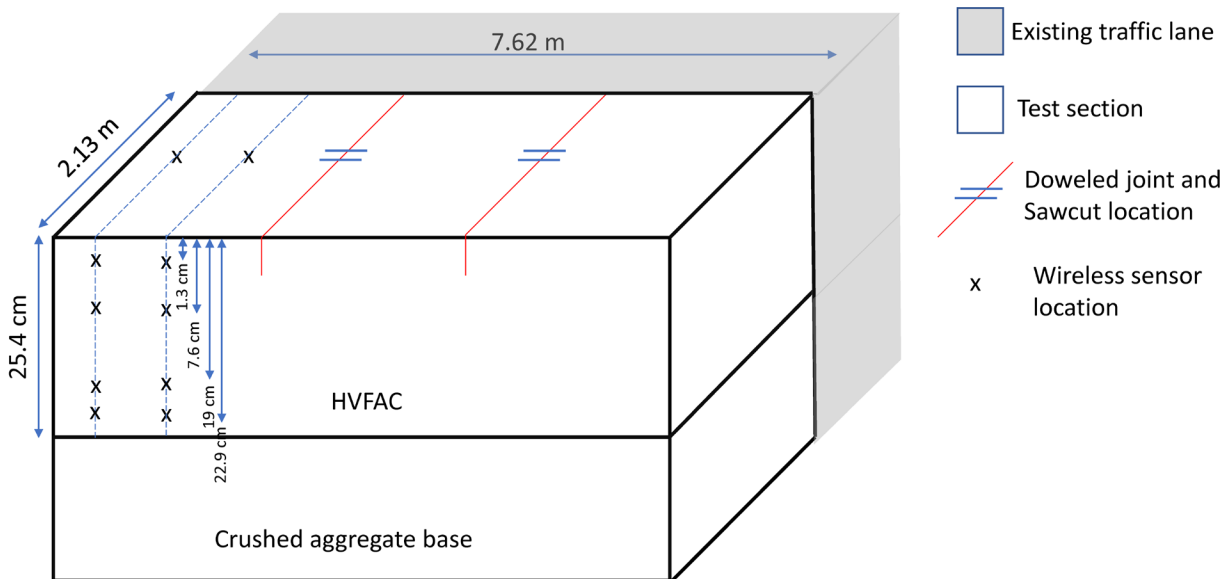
Photo. HVFAC field pavement test section details (not to scale).
